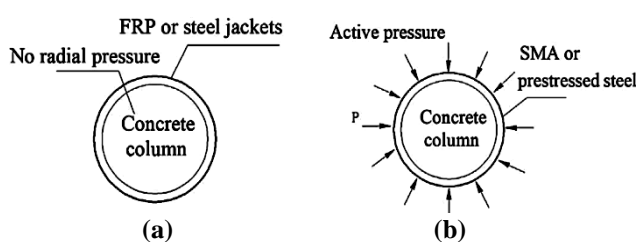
(a) passive and (b) active confinement on concrete cross-sections [2]
